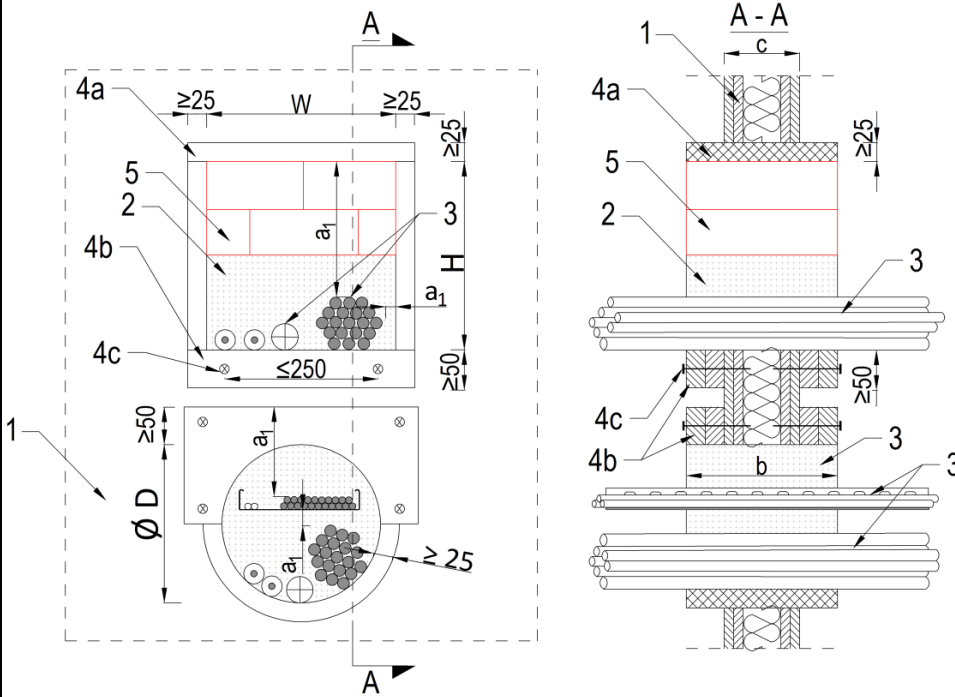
Cable penetration seal in flexible wall - detail with increased wall thickness
